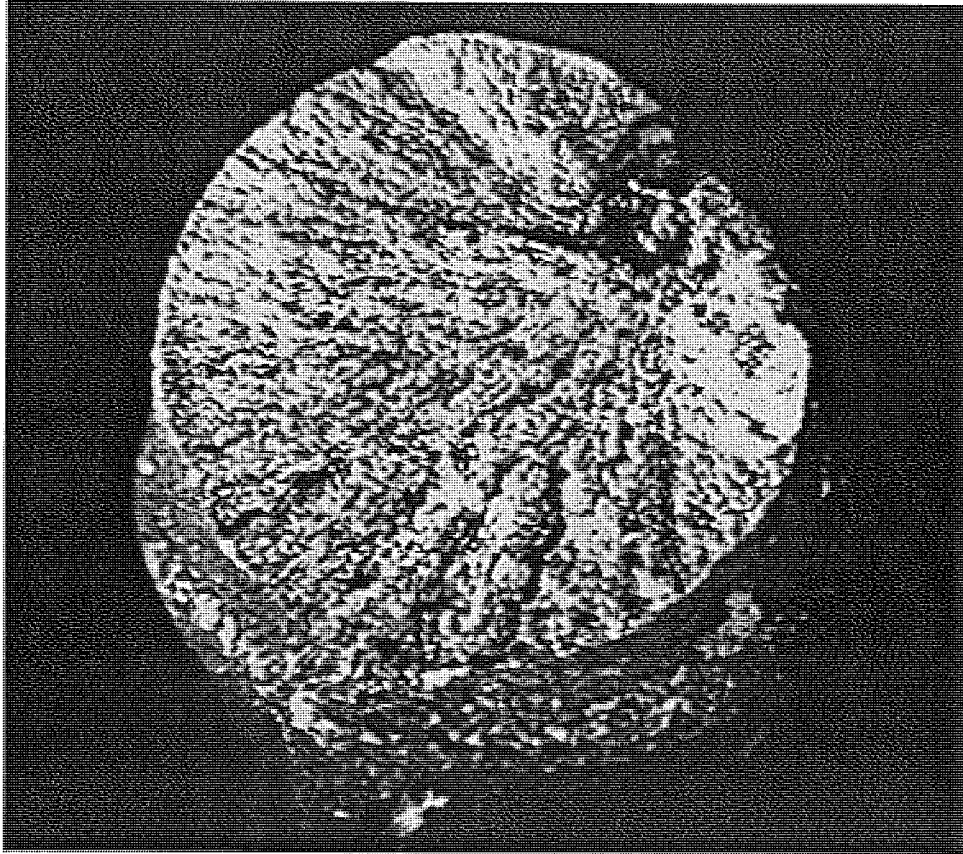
Fatigue Failure of a Steel Rebar (bar No.10)
